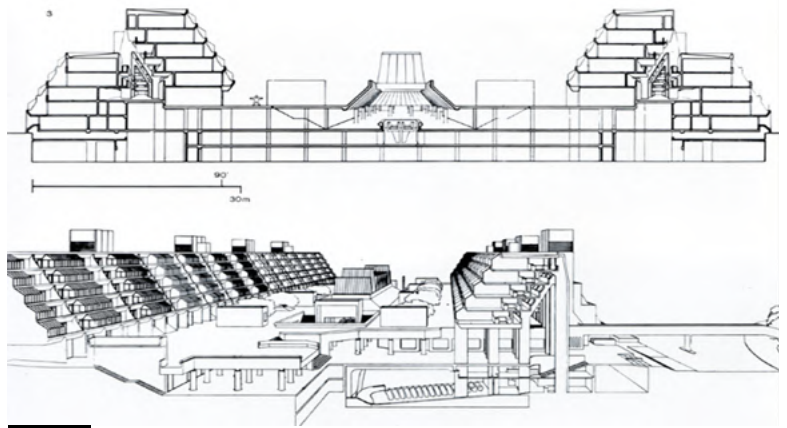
Brunswick Center in Bloomsbury (London) – section [Picture taken from: <https://www.pinterest.ch/pin/697917273479532929/>]
